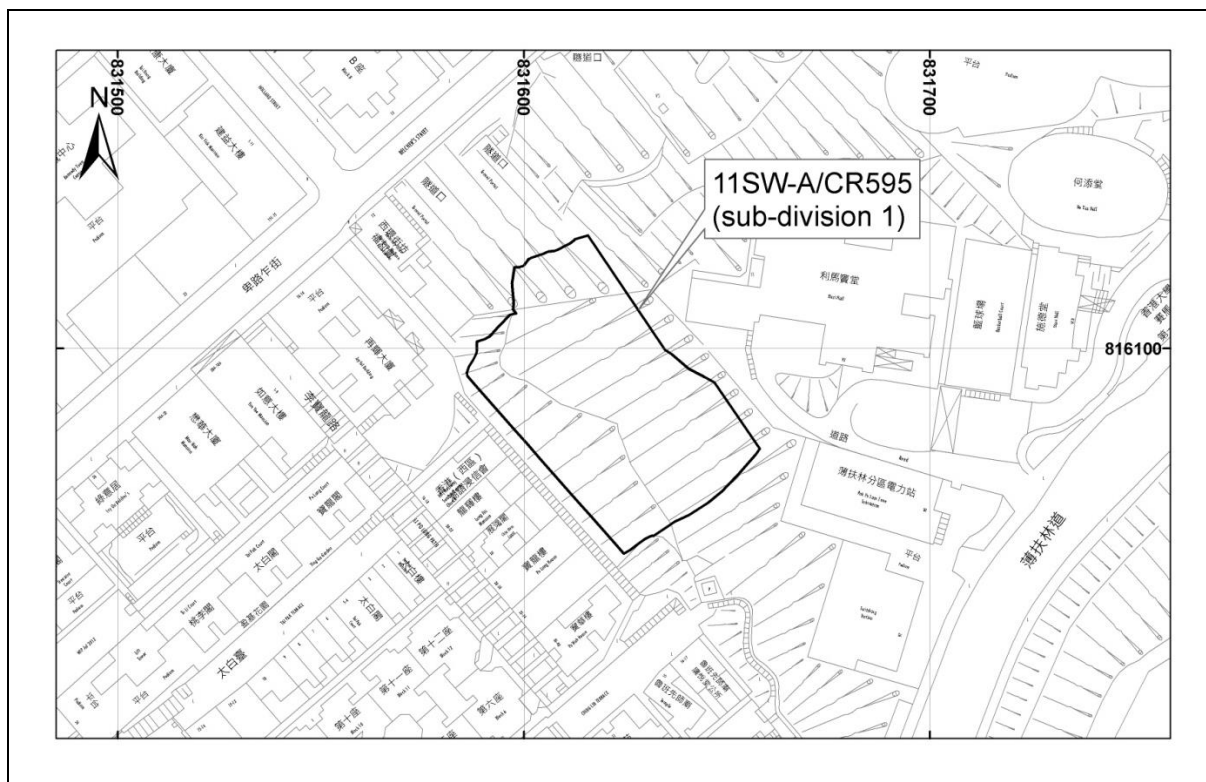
Location Plan of Slope No. 11SW-A/CR595 (sub-division 1) at Belcher's Street
